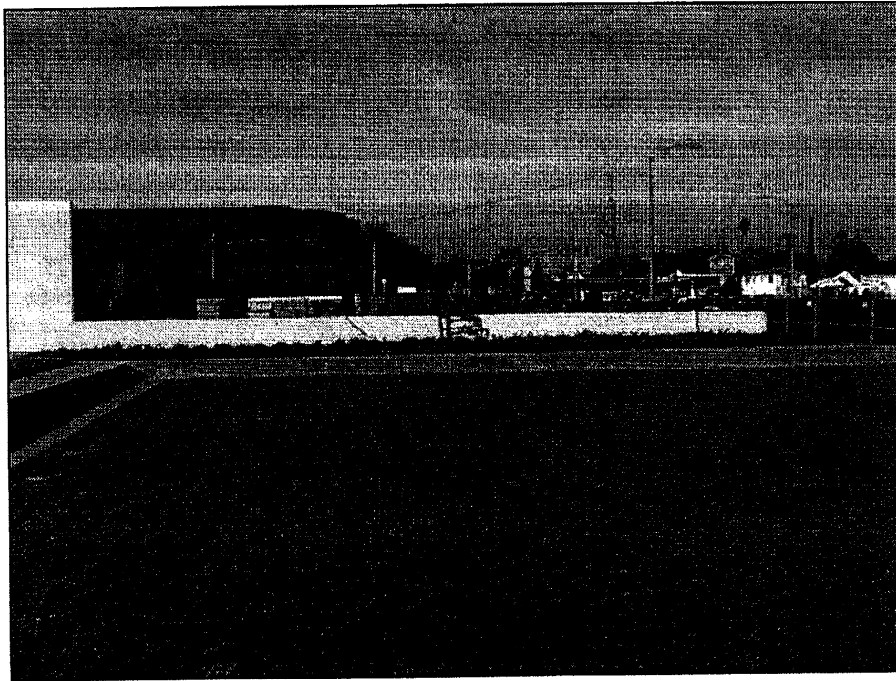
Stuart Building front yard setback (historic garden), raised planter and west garden wall, view west (Chattel Architecture (CA), 2006)
